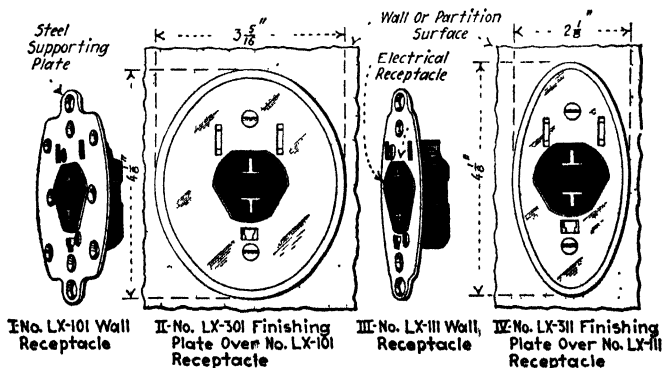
Standard wall Elexit receptacles, and receptacles in position under finishing plates.
